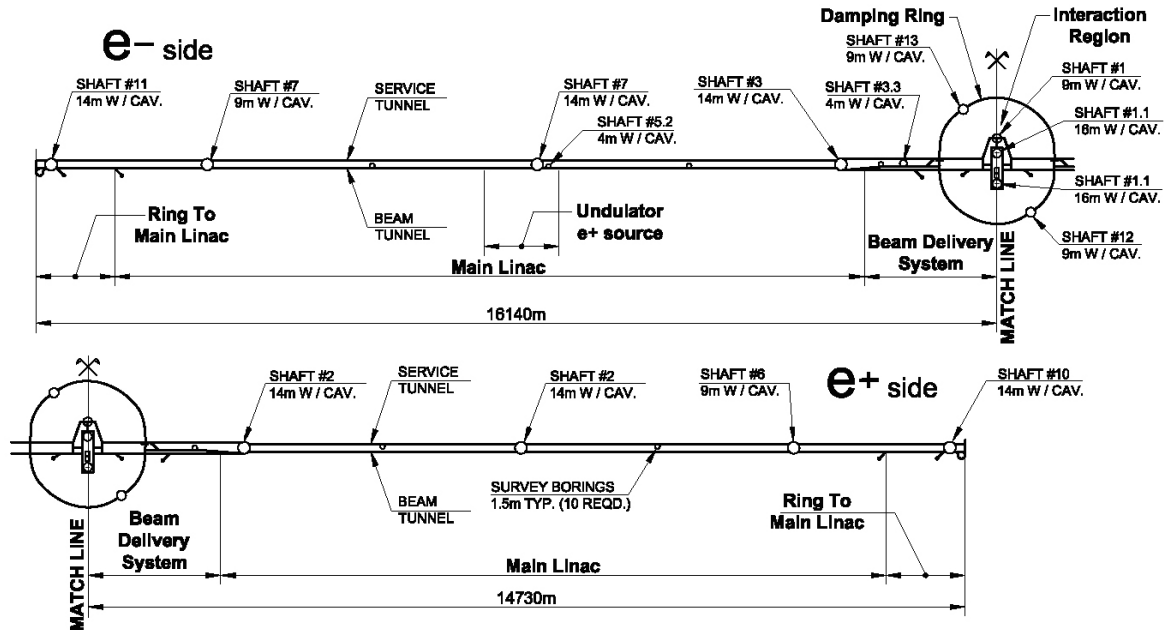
Layout of the civil construction, indicating the position of shafts and caverns.
